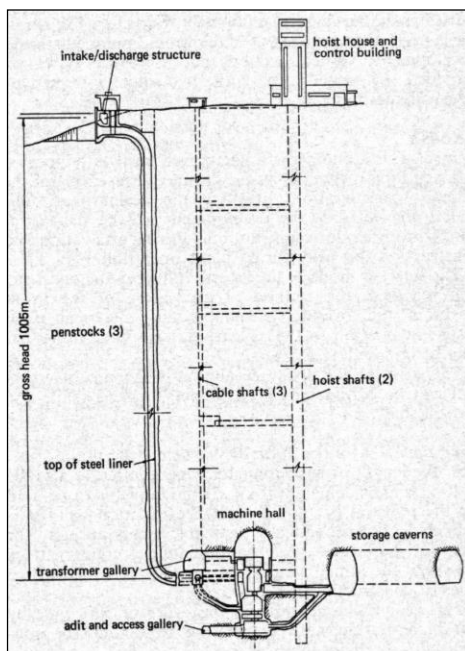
Single-stage Underground Pumped Hydro Storage layout from the 1970s [9]
